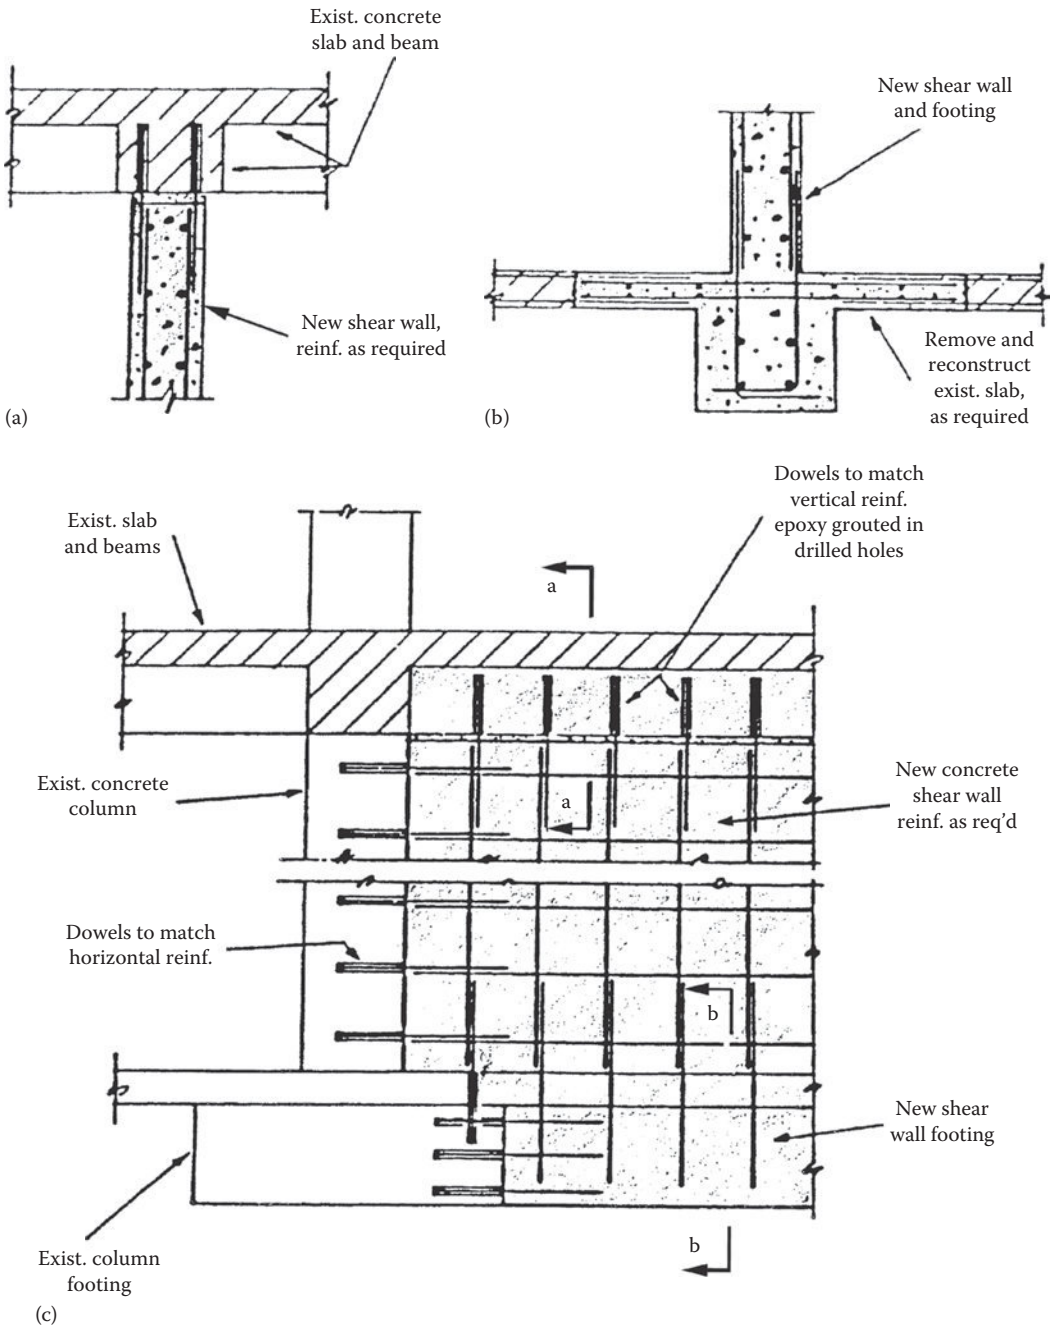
Strengthening of an existing concrete frame building by adding (N) a reinforced concrete shear wall: (a) section a-a, (b) section b-b, and (c) elevation.
